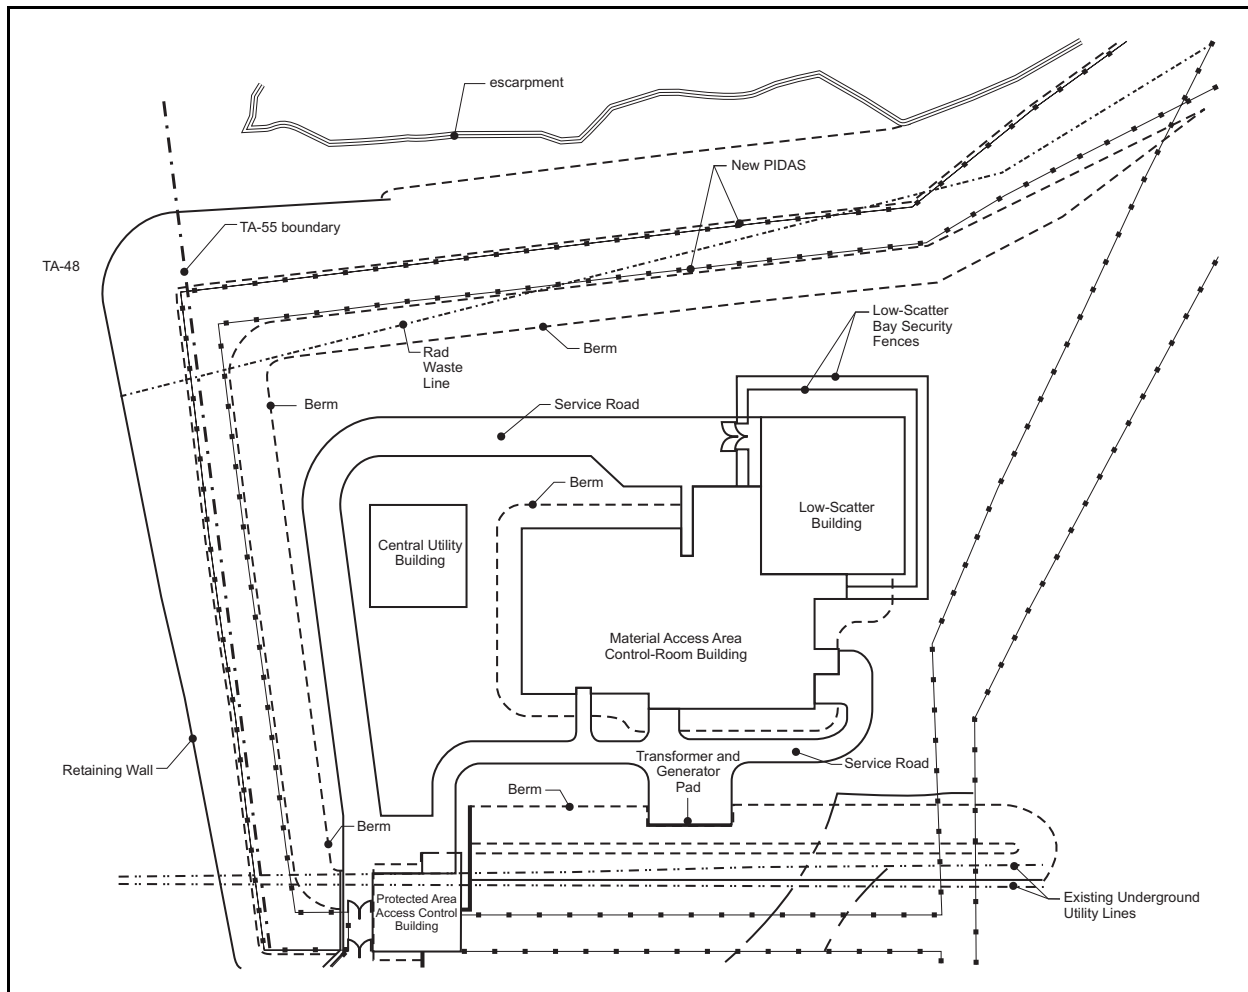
Site Plan for Proposed LANL Facility (LANL New Facility Alternative)
